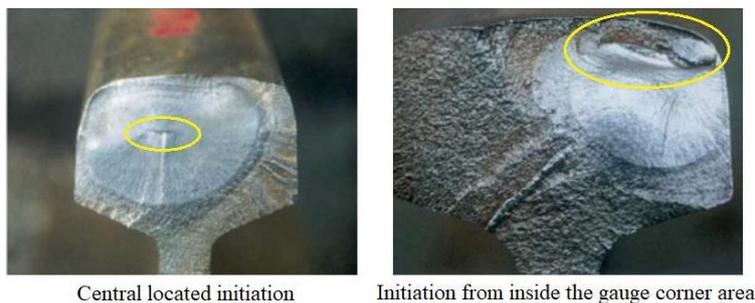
Kidney-shaped fatigue crack due to internal inclusion (manufacturing defect)
